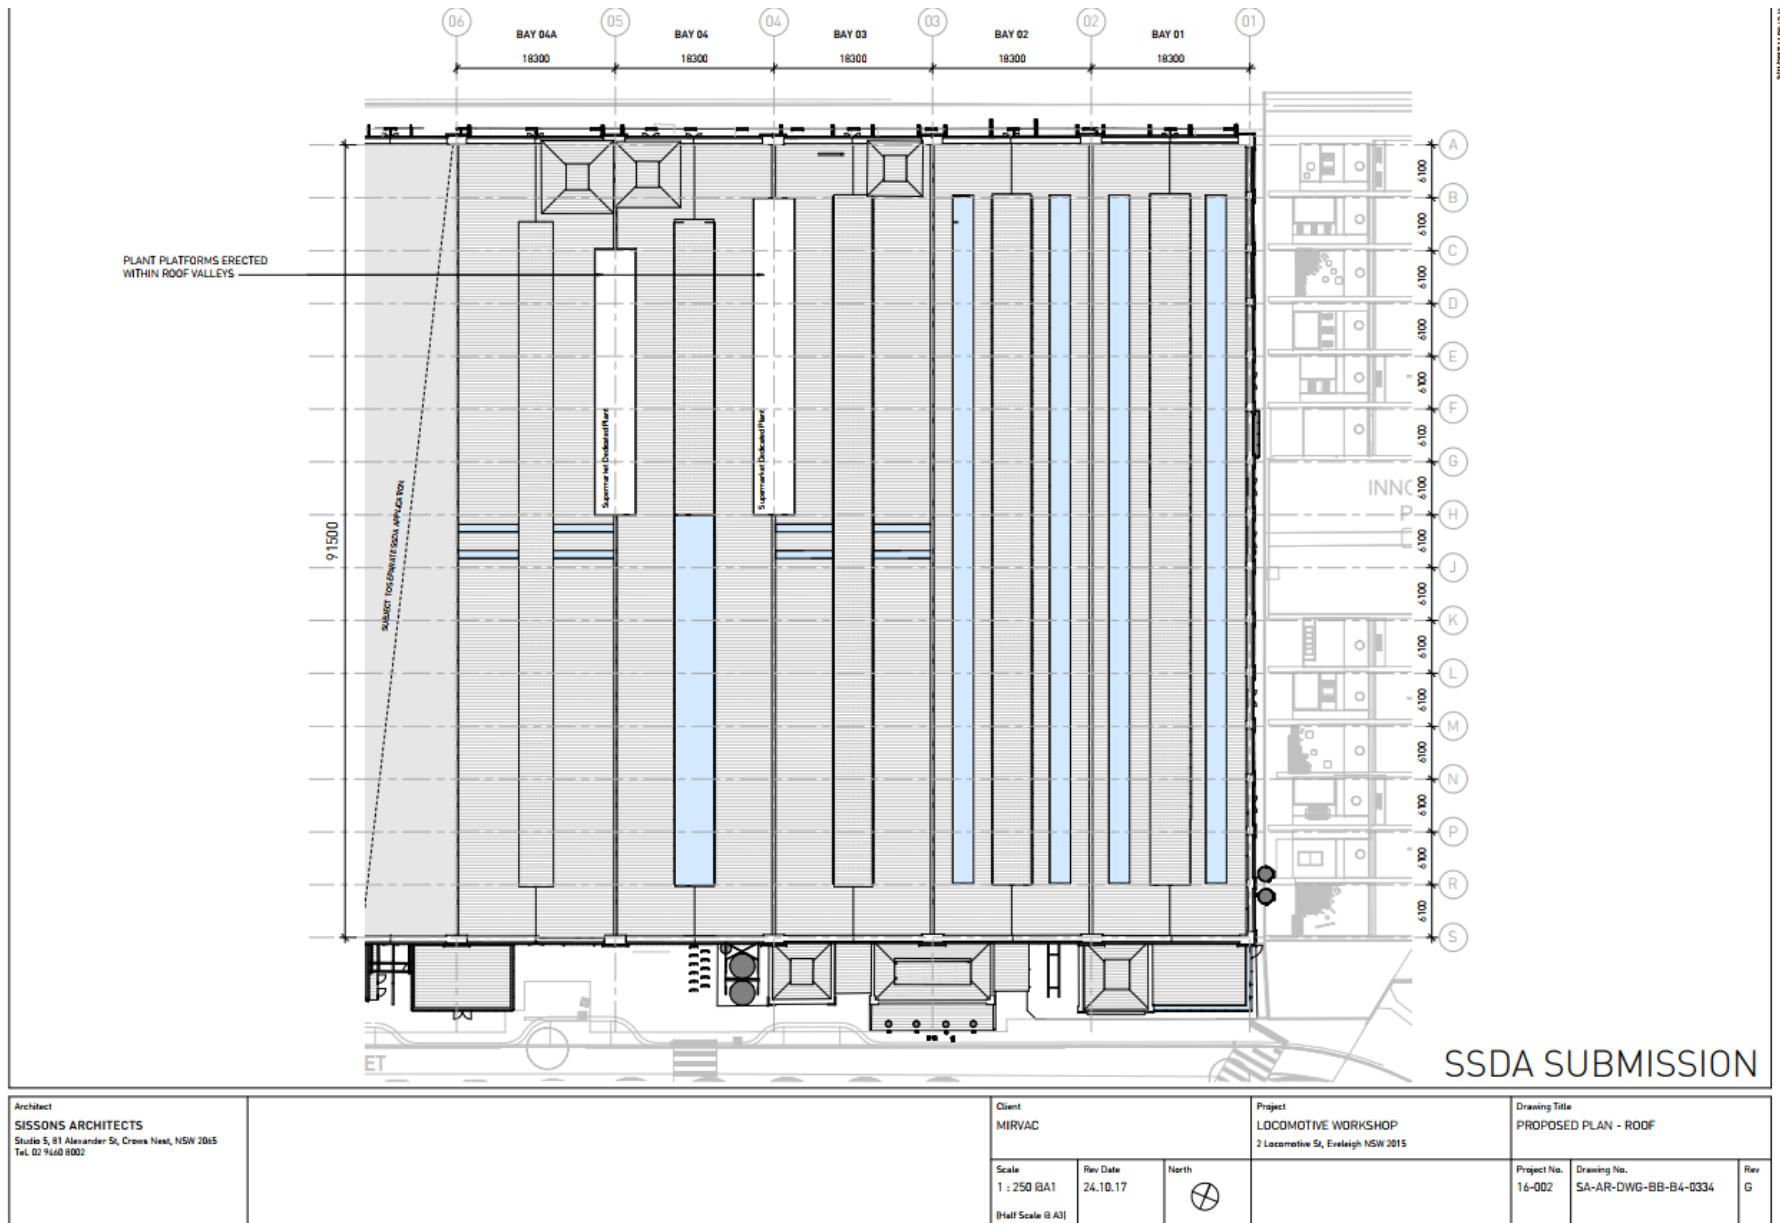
PROPOSED PLAN—ROOF (SOURCE: SISSONS, DRAWING SA-AR-DWG-BB-B4-0334, REVISION G, 24.10.17)
